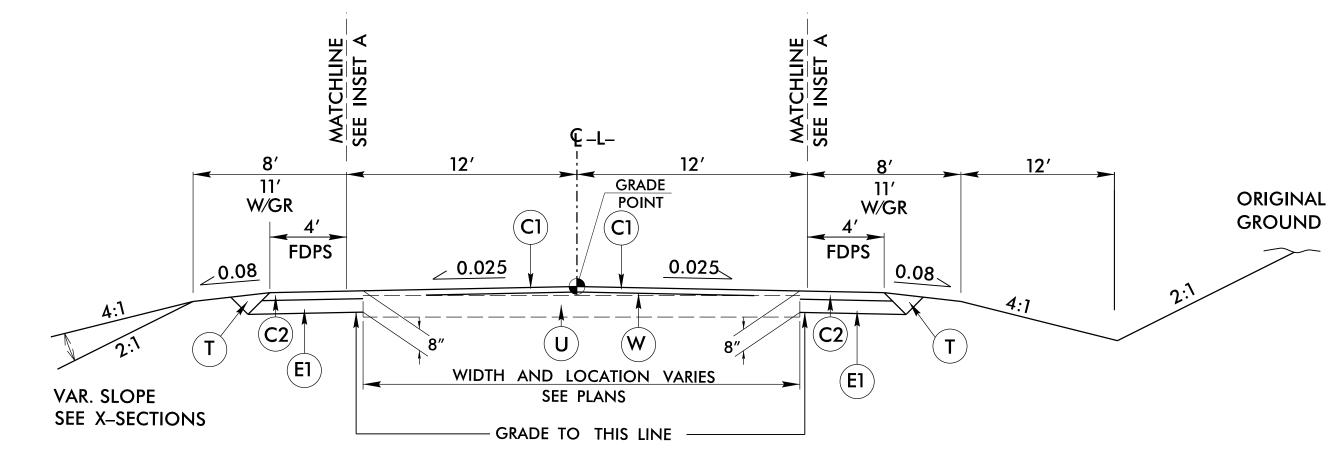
DETAIL SHOWING SHOULDER BERM GUTTER (SBG) ON TOP OF SUBGRADE
